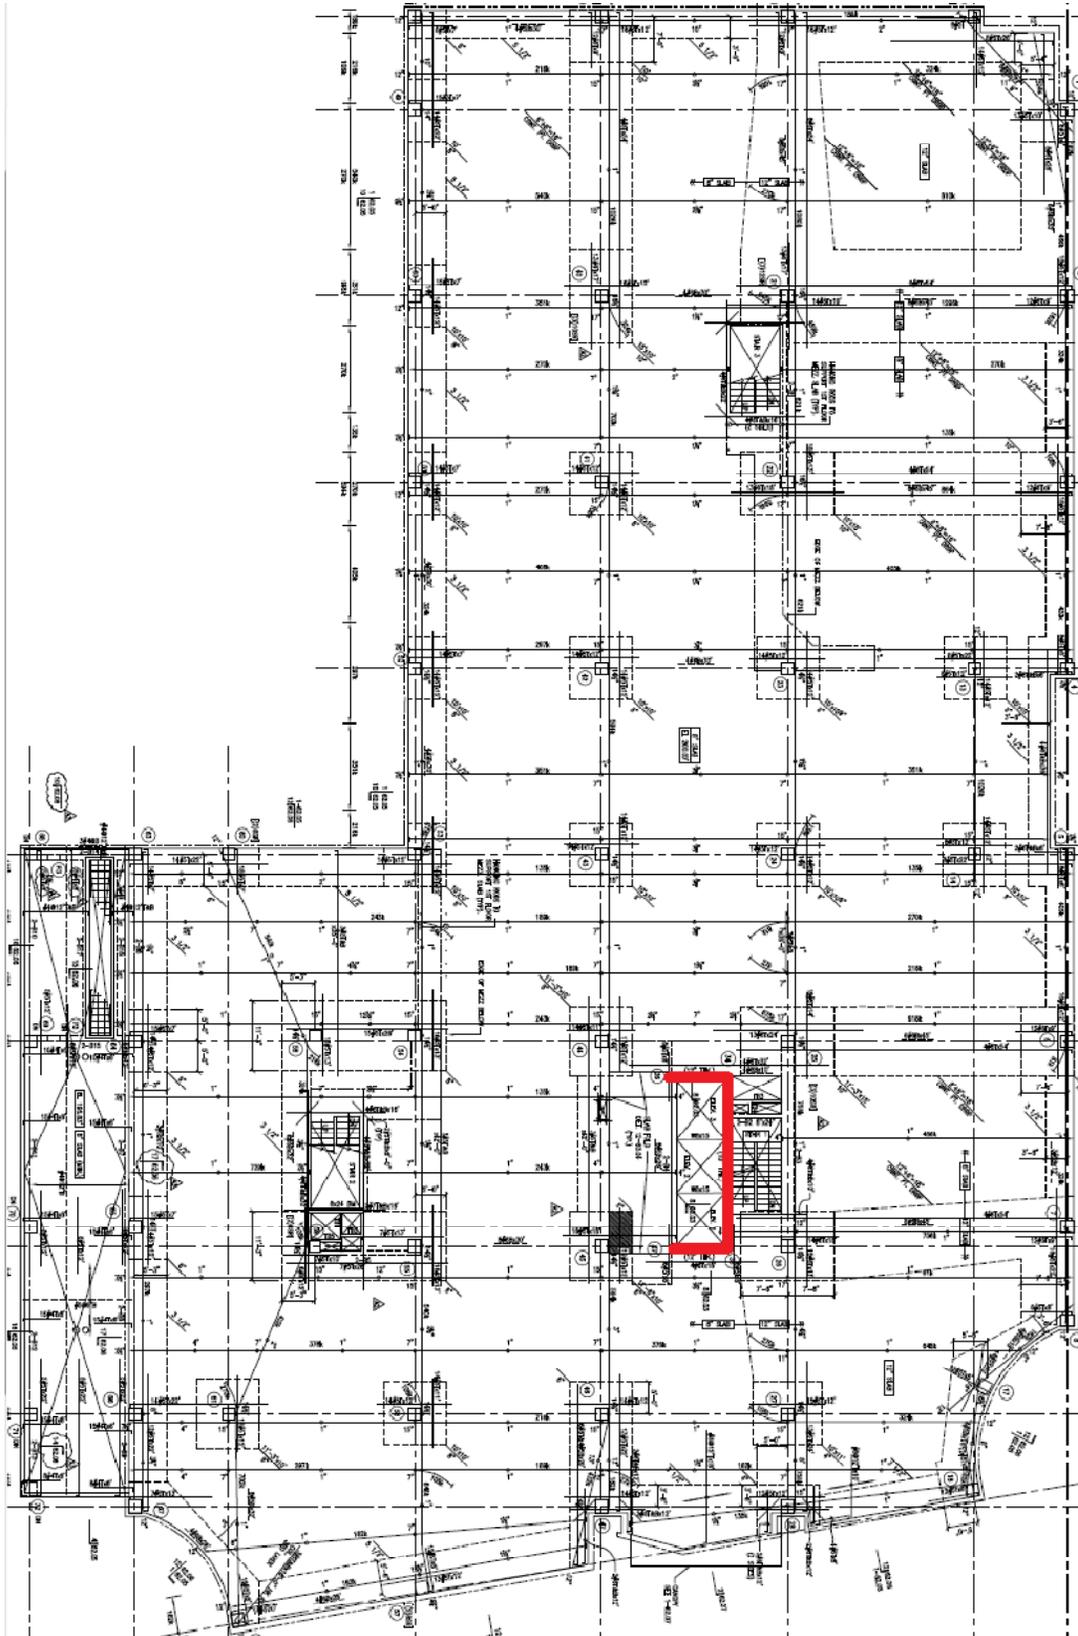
2nd Floor Framing Plan: shear walls highlighted in red
